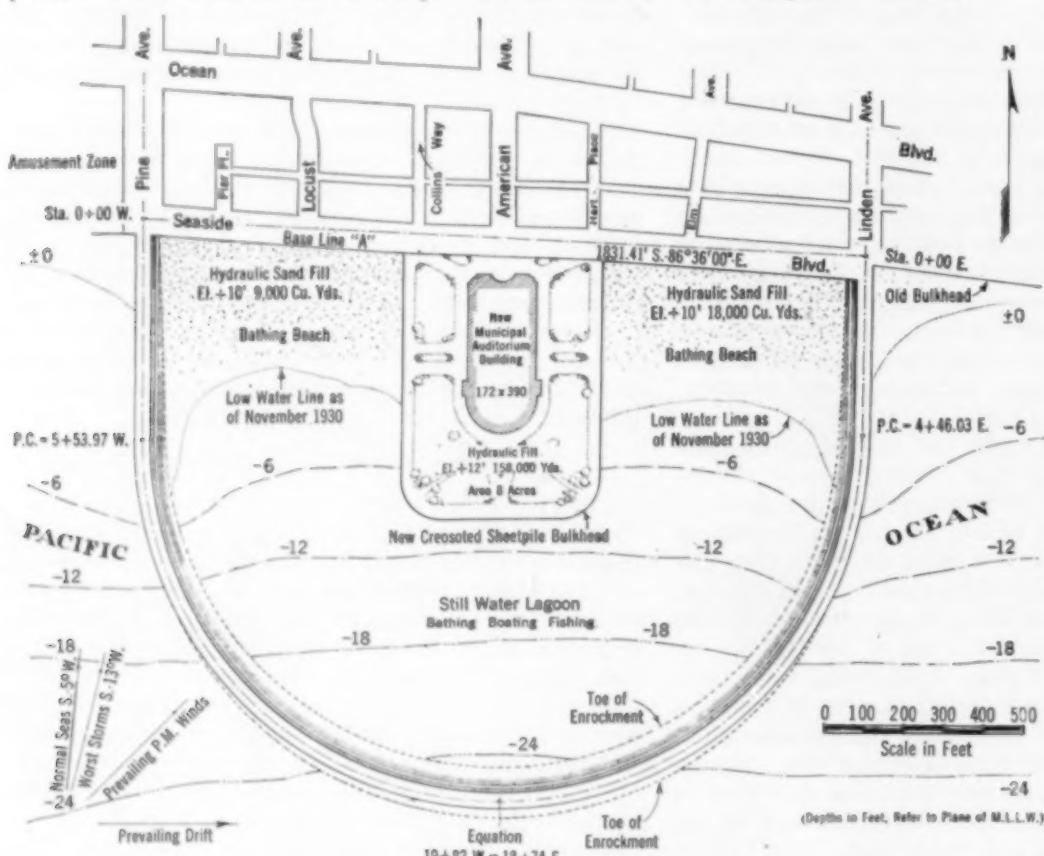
COMPLETION PLAN, RAINBOW PLEASURE PIER
